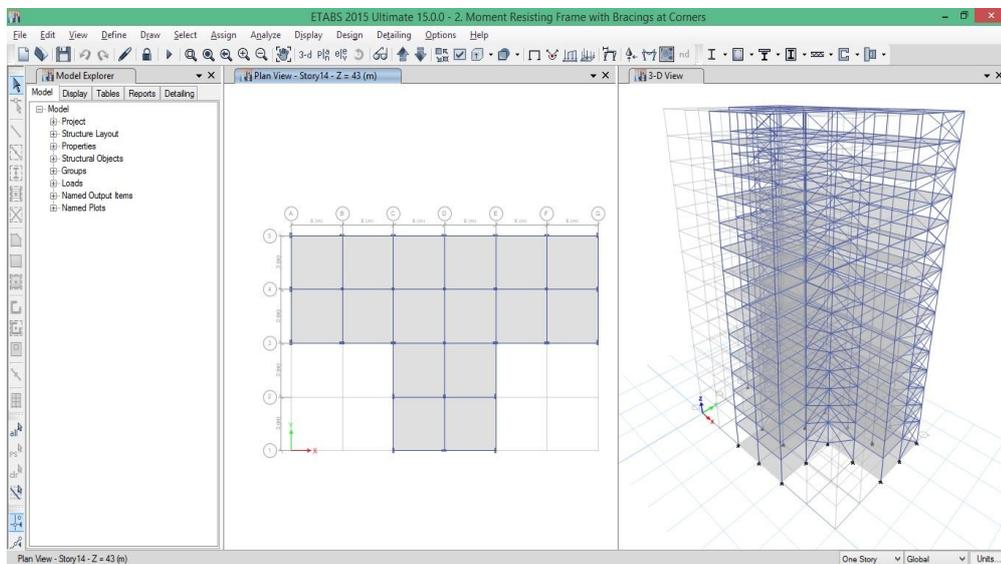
Plan & 3D view of Model-2 (Moment Resisting Frame with Bracings – MRBR)
